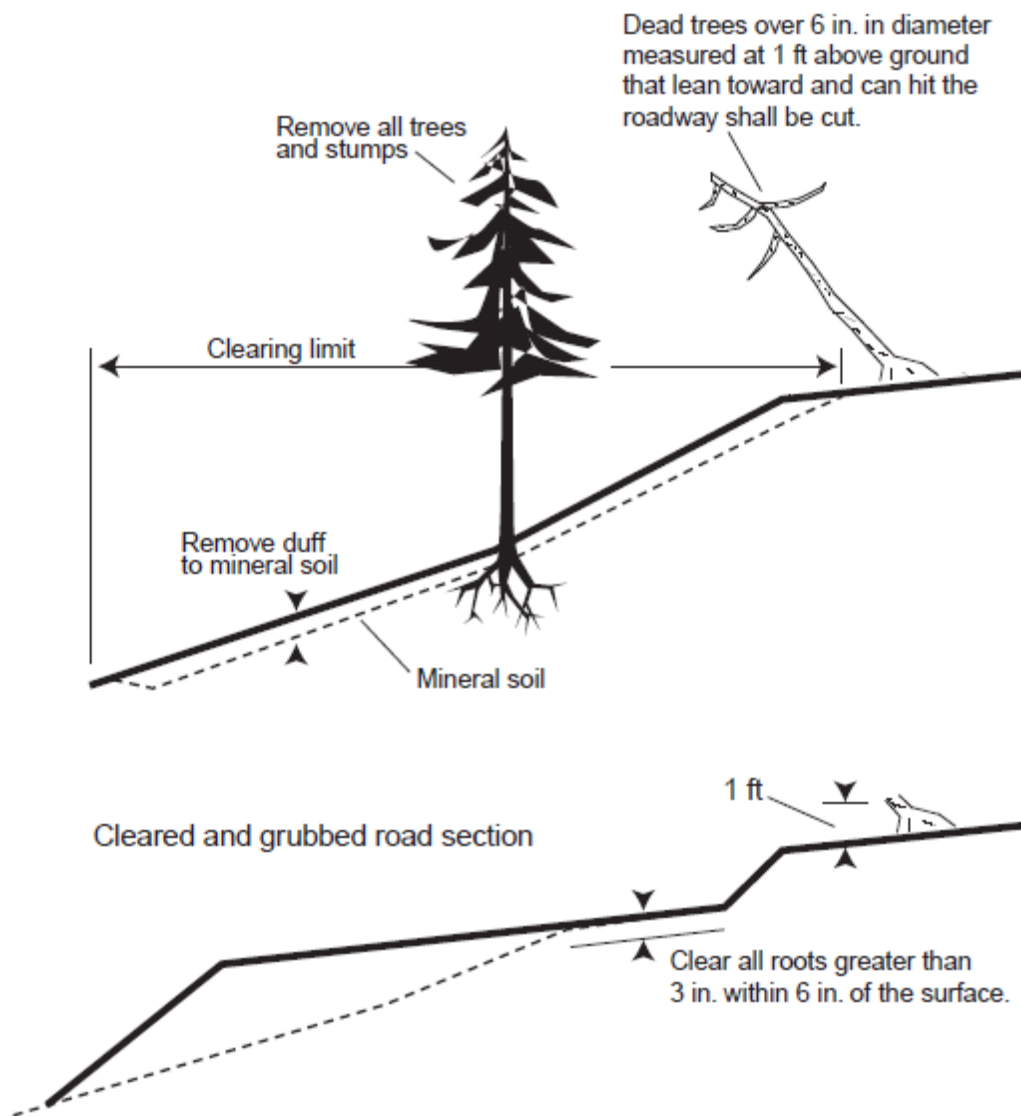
Example clearing and grubbing specifications for a section of forest road.
